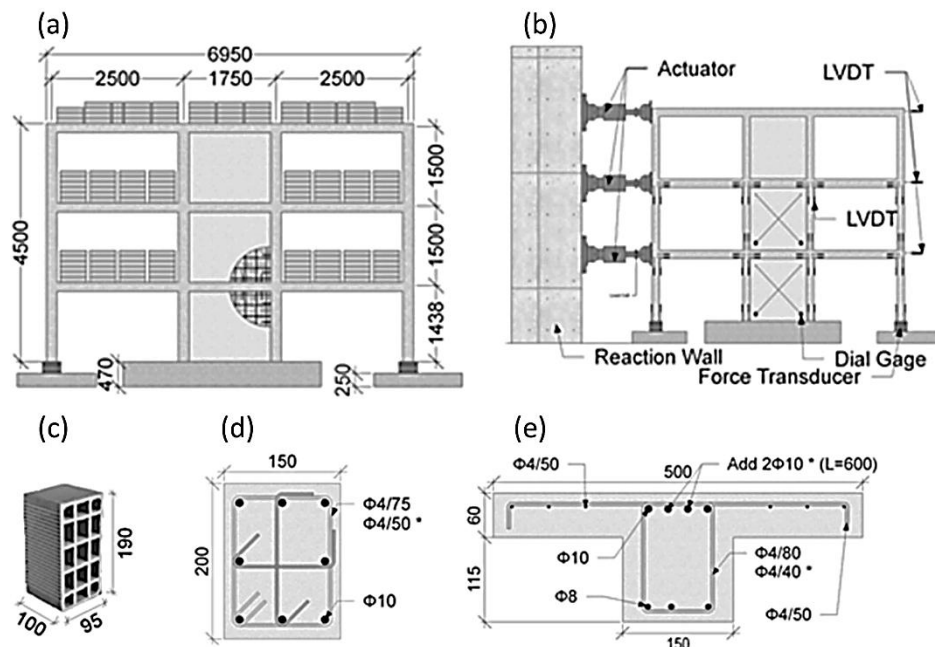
Test frame details (Ezzatfar et. al. 2012): (a) test frame dimensions (b) test set-up (c) hollow clay tile brick (d) column section detail (e) beam section detail (* denotes additional reinforcement and change in spacing in confined region, dimensions are in mm)
